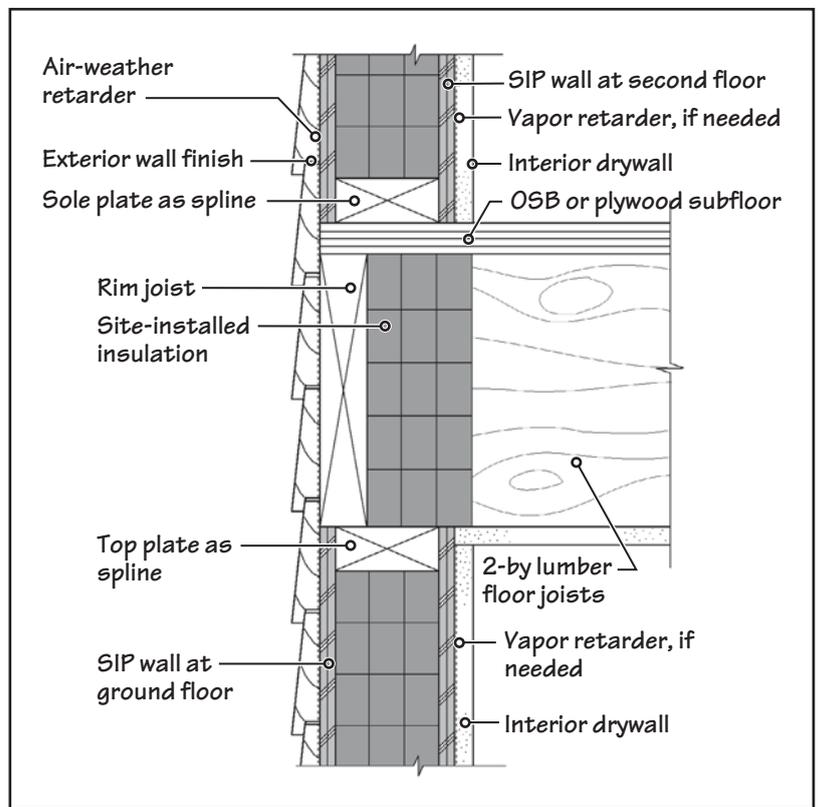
Detail at the junction of a SIP floor and a SIP wall. The detail is similar to that used in a conventional wood frame building. Site-installed insulation is needed behind the rim joist.
